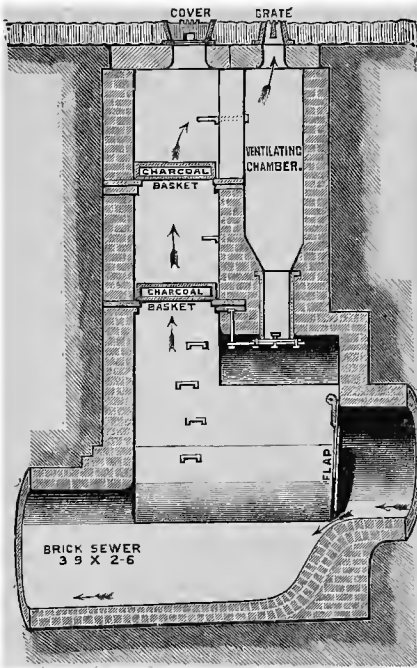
Manhole, tumbling-bay, and double ventilating arrangement.
